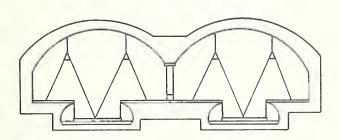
Cross Section of a Side Platform-Below Grade Transit Station (Type 3)
